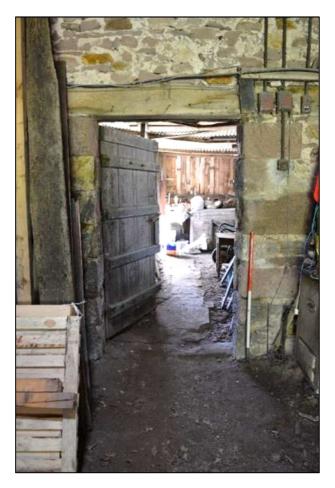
(Shot 52): View from barn through to adjacent lean-to (Building 4), looking east (1m scale)
